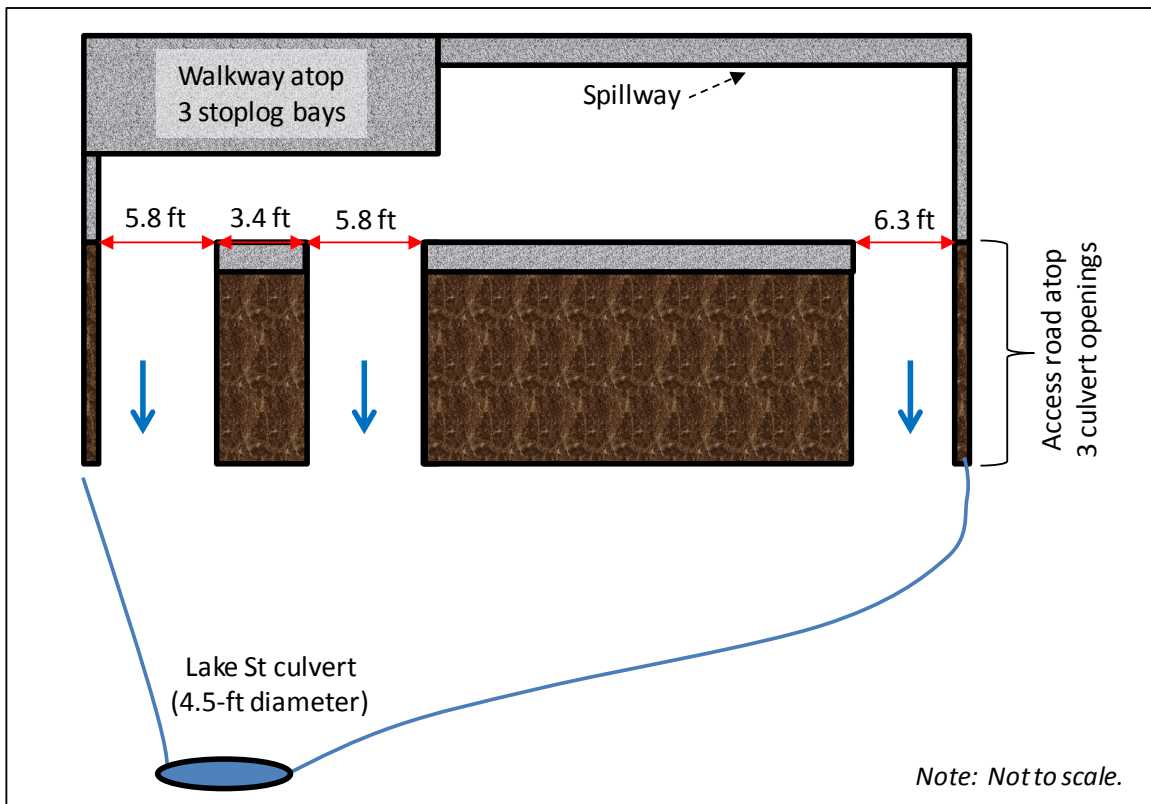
Forge Pond Dam Schematic – Elevation View
